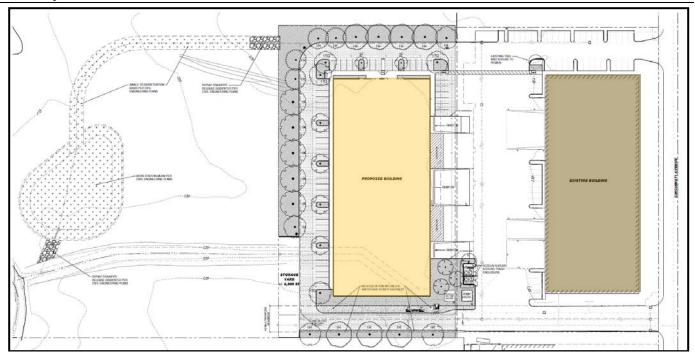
Proposed Site Plan (existing building right, proposed building left)
